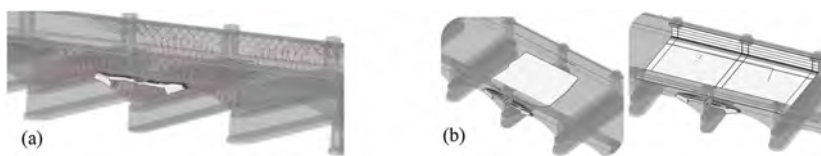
Bridge strengthening and renew by net of carbon bars drilled inside the masonry walls, sealing and stitching with stainless steel bars of main arch cracks (a), ultra-light weight concrete to fill and stabilize the deck slab, new waterproofing (b).
